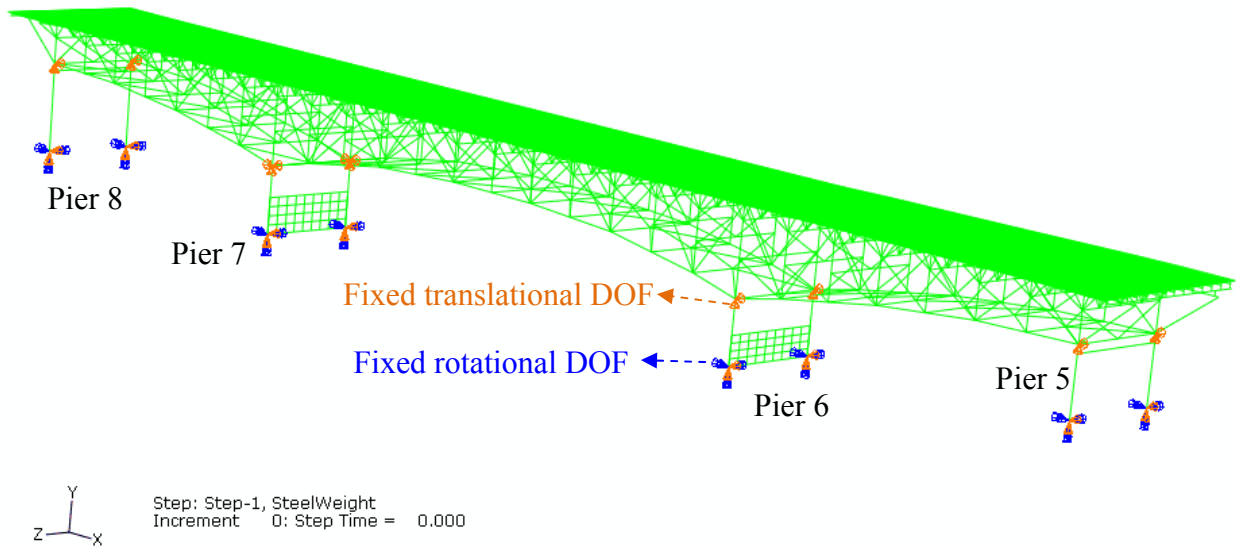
Boundary conditions in the first step of the sixth FHWA structural element bridge model ^[1]
